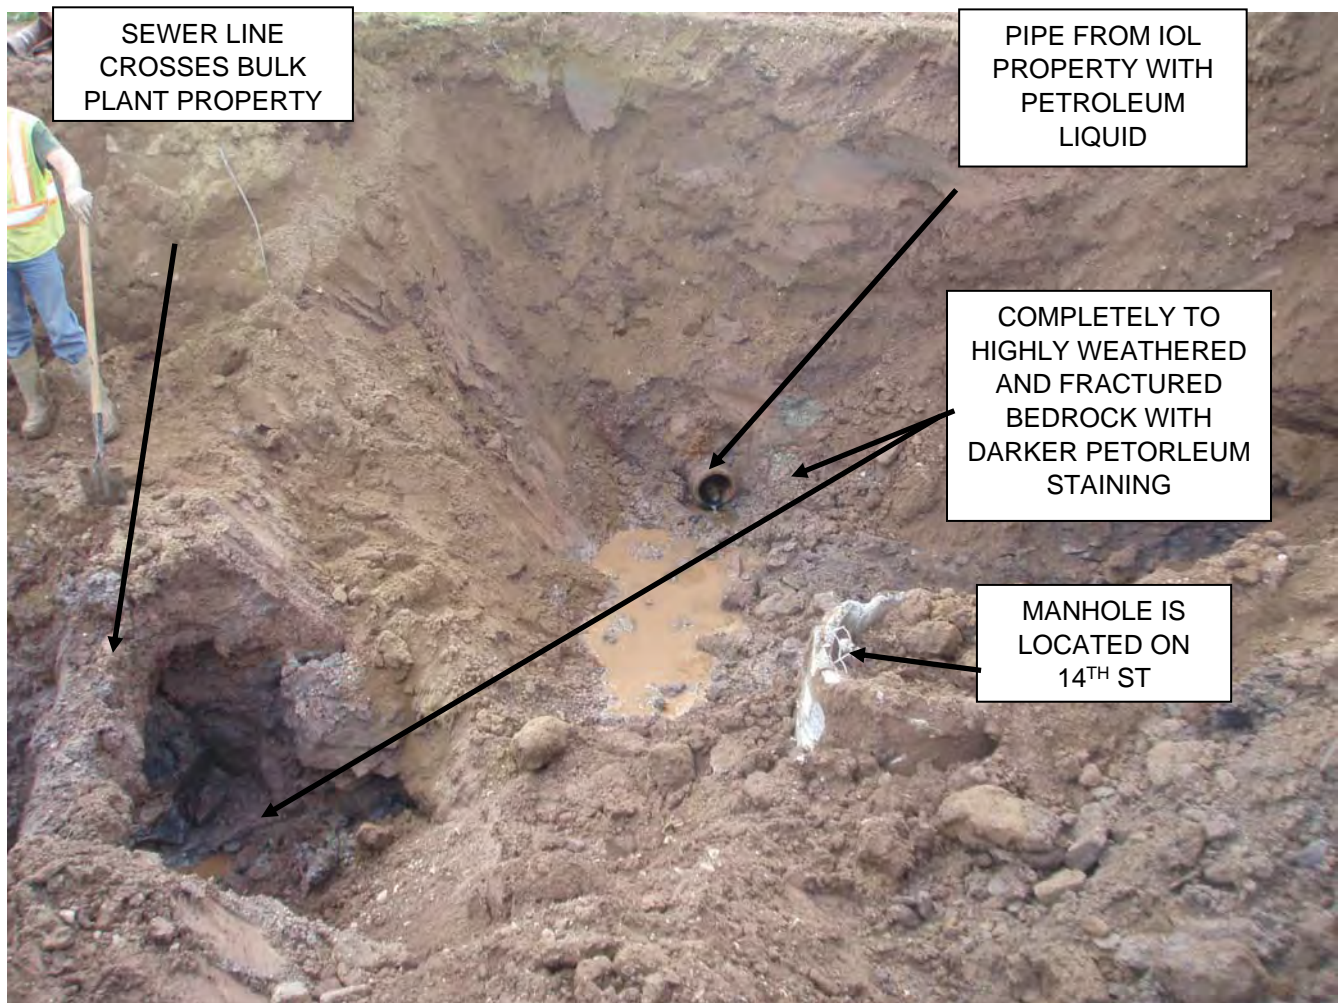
Underground sewer line at the boundary of IOL bulk plant and 14<sup>th</sup> street. Original sewer line located on the bulk plant property and parallel to the east side of the IOL bulk plant. IOL would not allow the line to be upgraded and Town had to do a build around. A four inch pipe was also encountered at the IOL bulk plant property boundary, with petroleum contaminated liquid being emitted.
